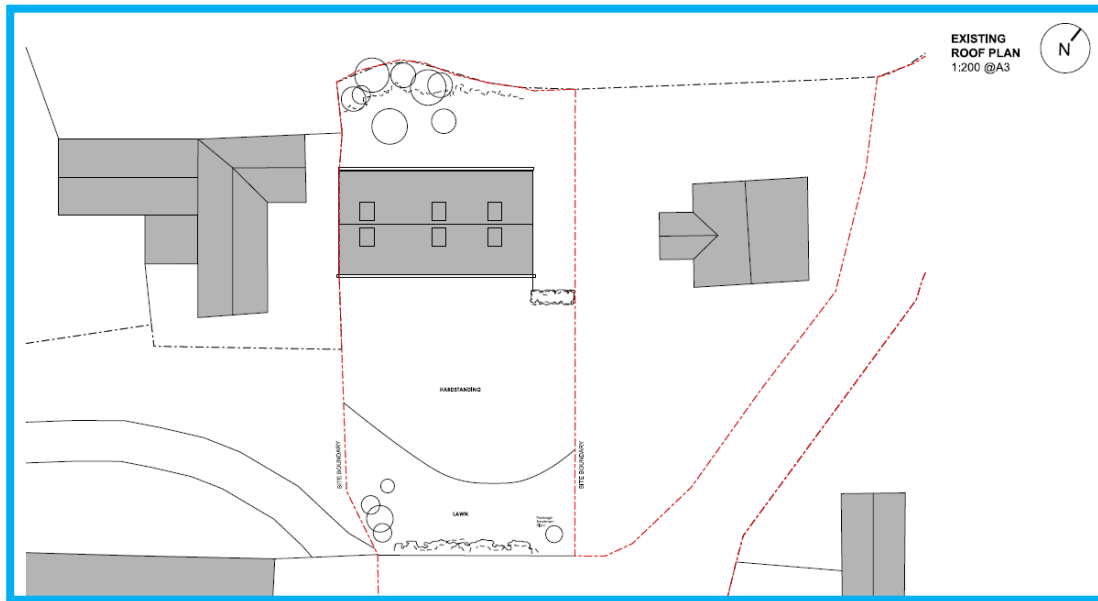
Existing roof plan of outbuilding with rooflights within red line. The area below the outbuilding (southeast) is shown largely as hardstanding with a small lawn area. Note north point in top right corner of image (Mitchel Eley Gould).
